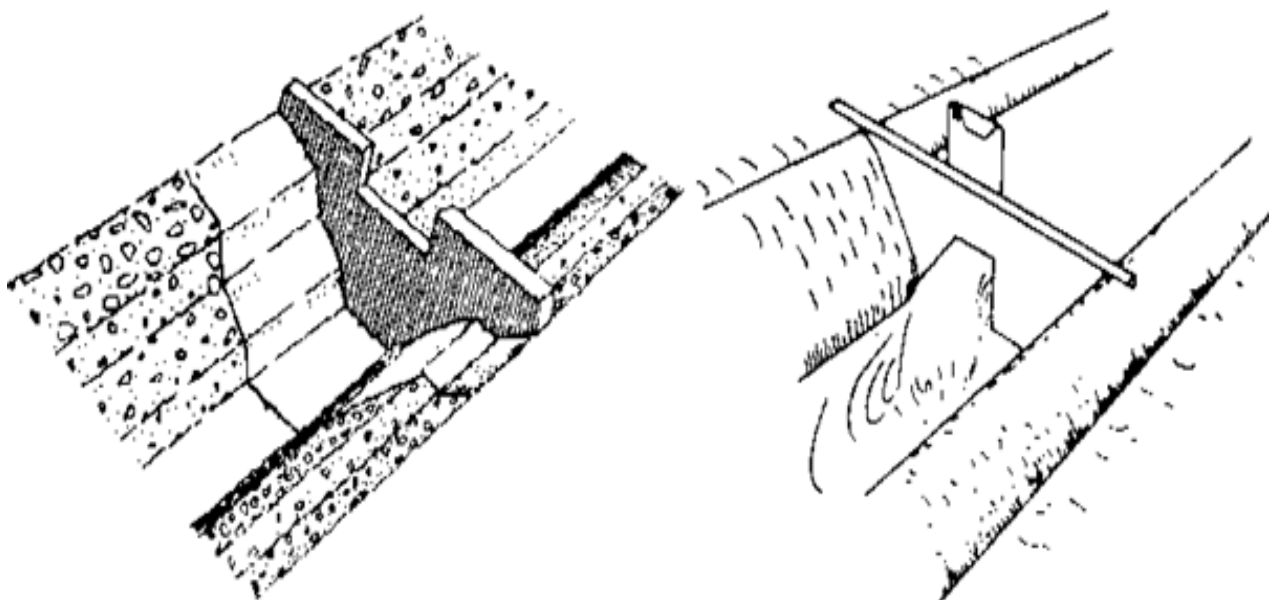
A permanent concrete check    Figure 20: A permanent concrete check
